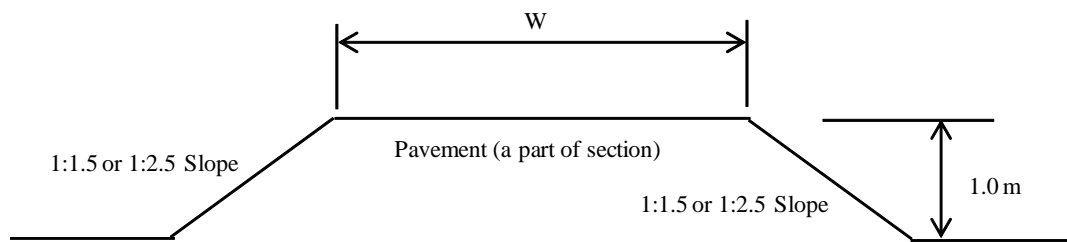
RCC Road Section (Submerged) (Upazila Road)
